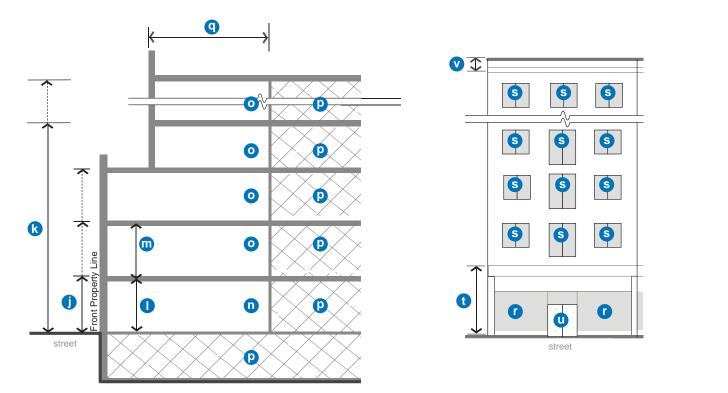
(2). Storefront Building: Height & Use Requirements.
